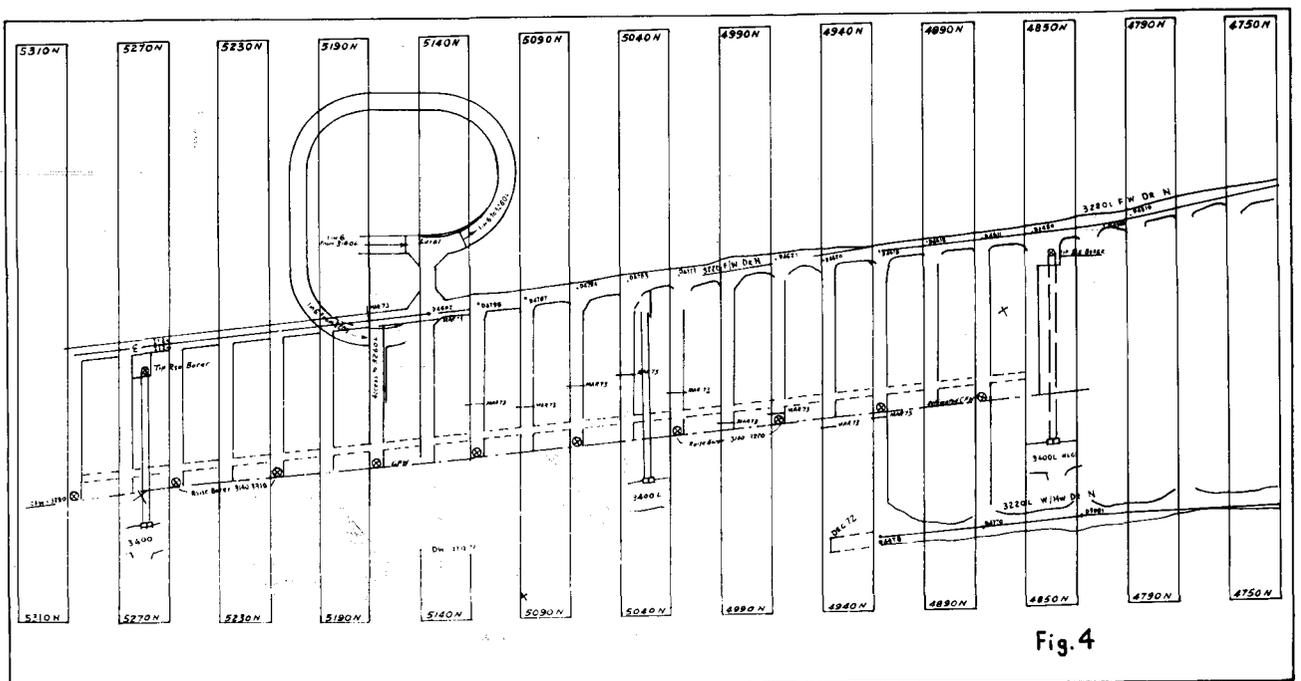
A loader drive connecting the access crosscuts, Mindola Mine
